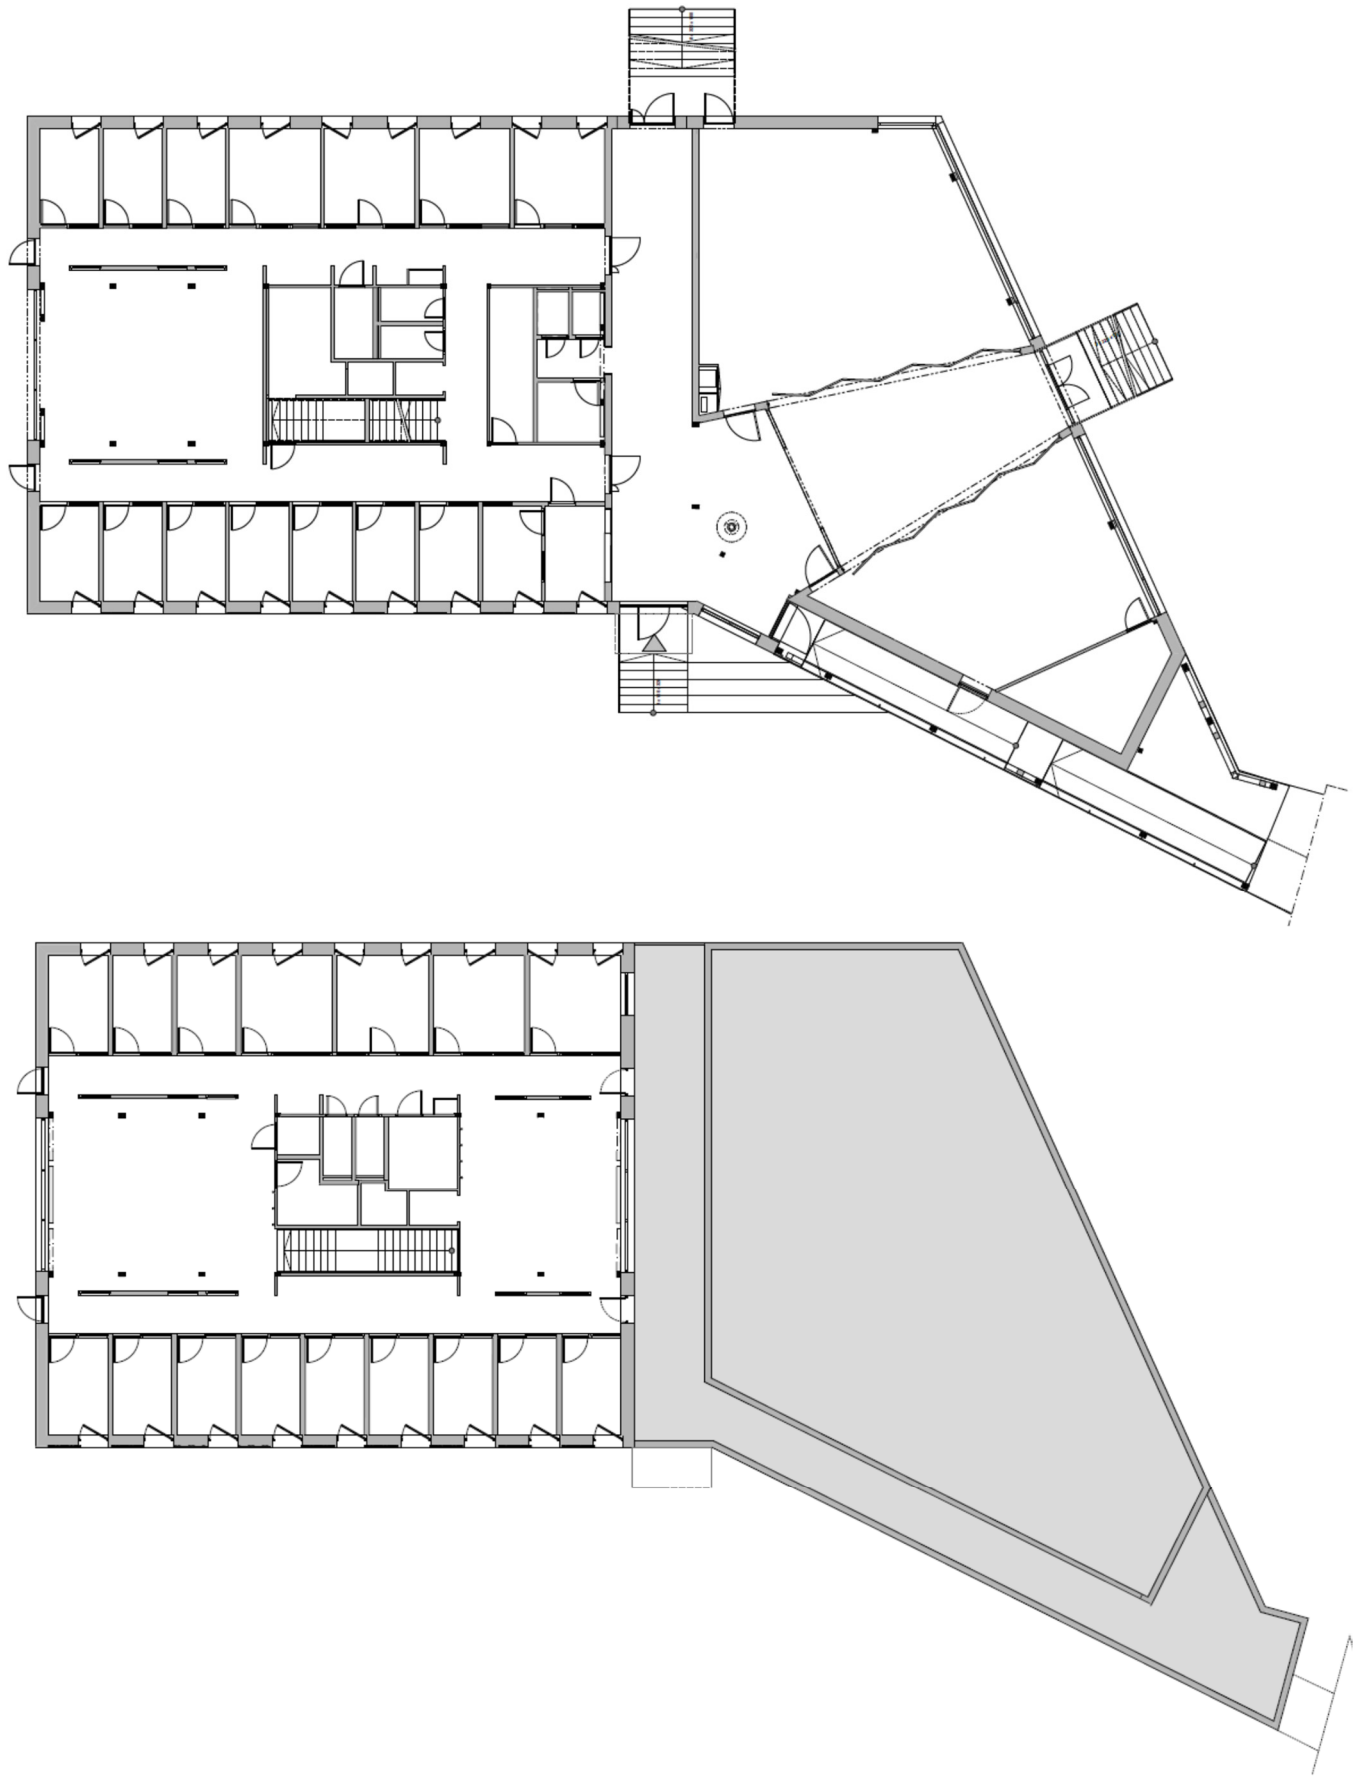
Ground (above) and first (below) floor plan of the new administration and educational building at Campus Evenstad, courtesy of Ola Roald AS.
